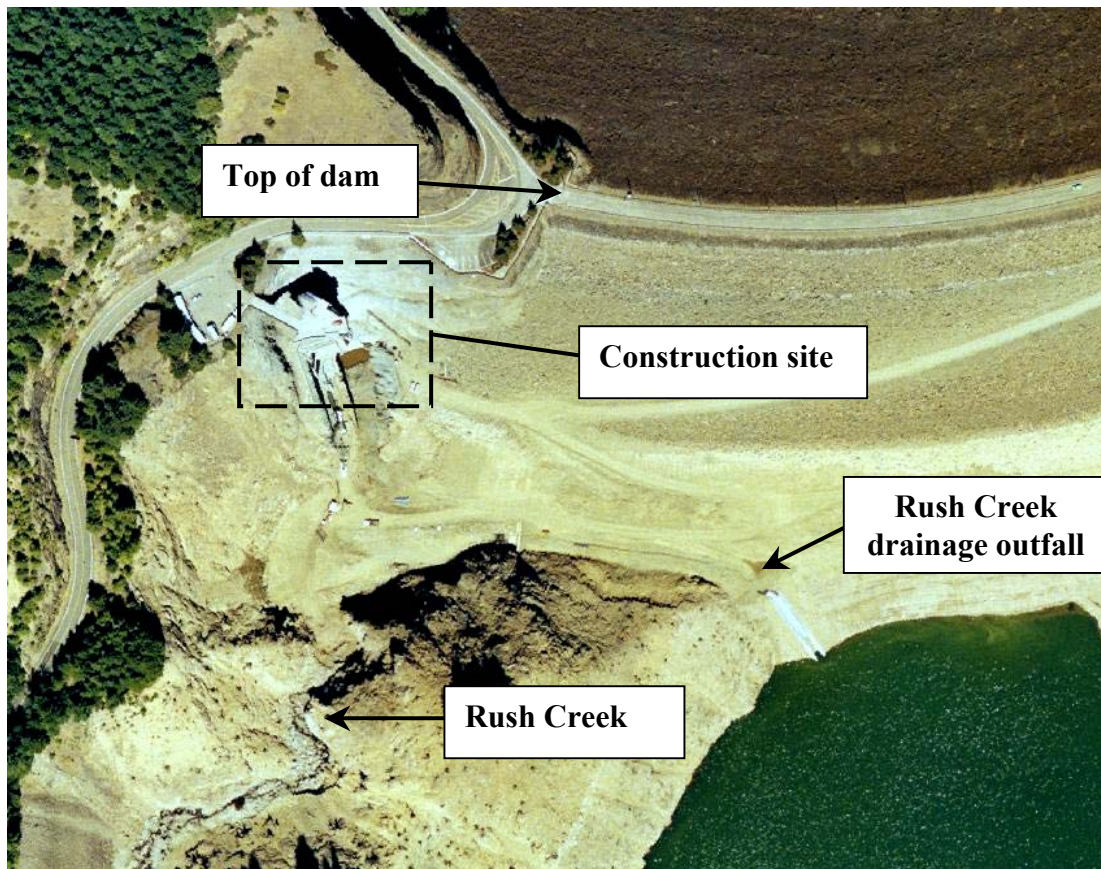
WTC - Cougar construction site. Reservoir pool elevation 1400 feet.
